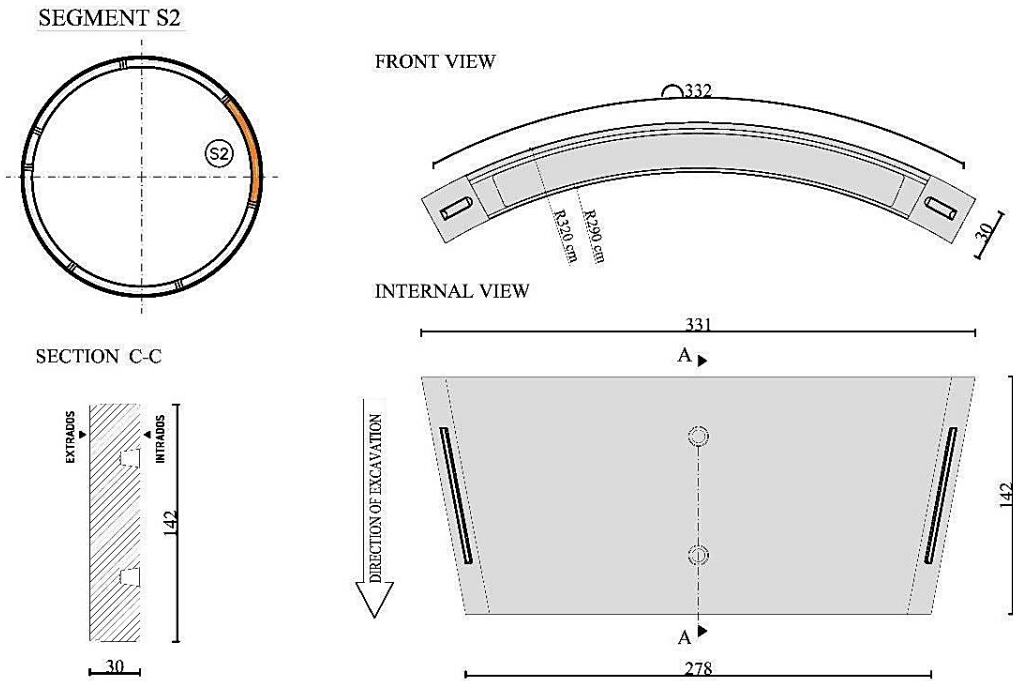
Metro tunnel: segment ring details and adopted precast segment (measured in cm) [116].
